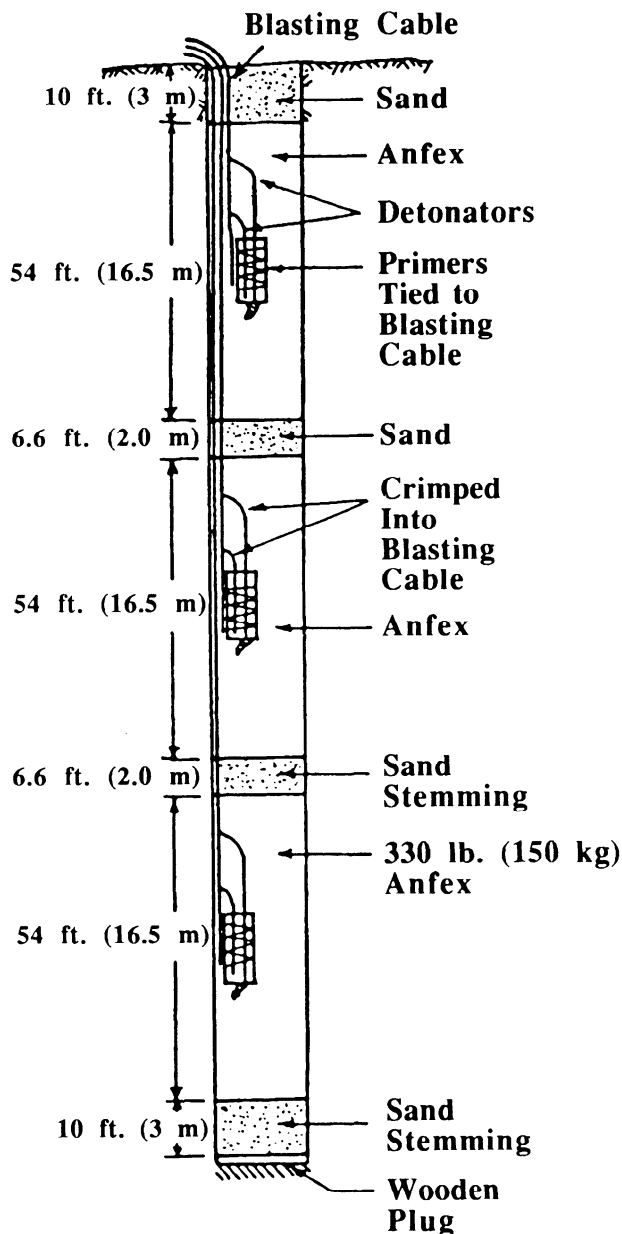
Explosives layout in a large-diameter hole showing spacers (Pandey, 1984).
